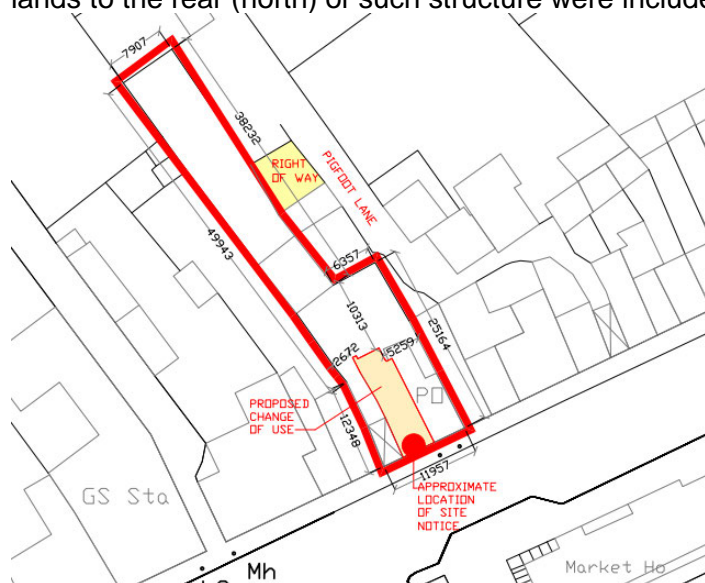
Site layout plan for application reference 2260310, including the old sorting office and all open space to the north of same.
